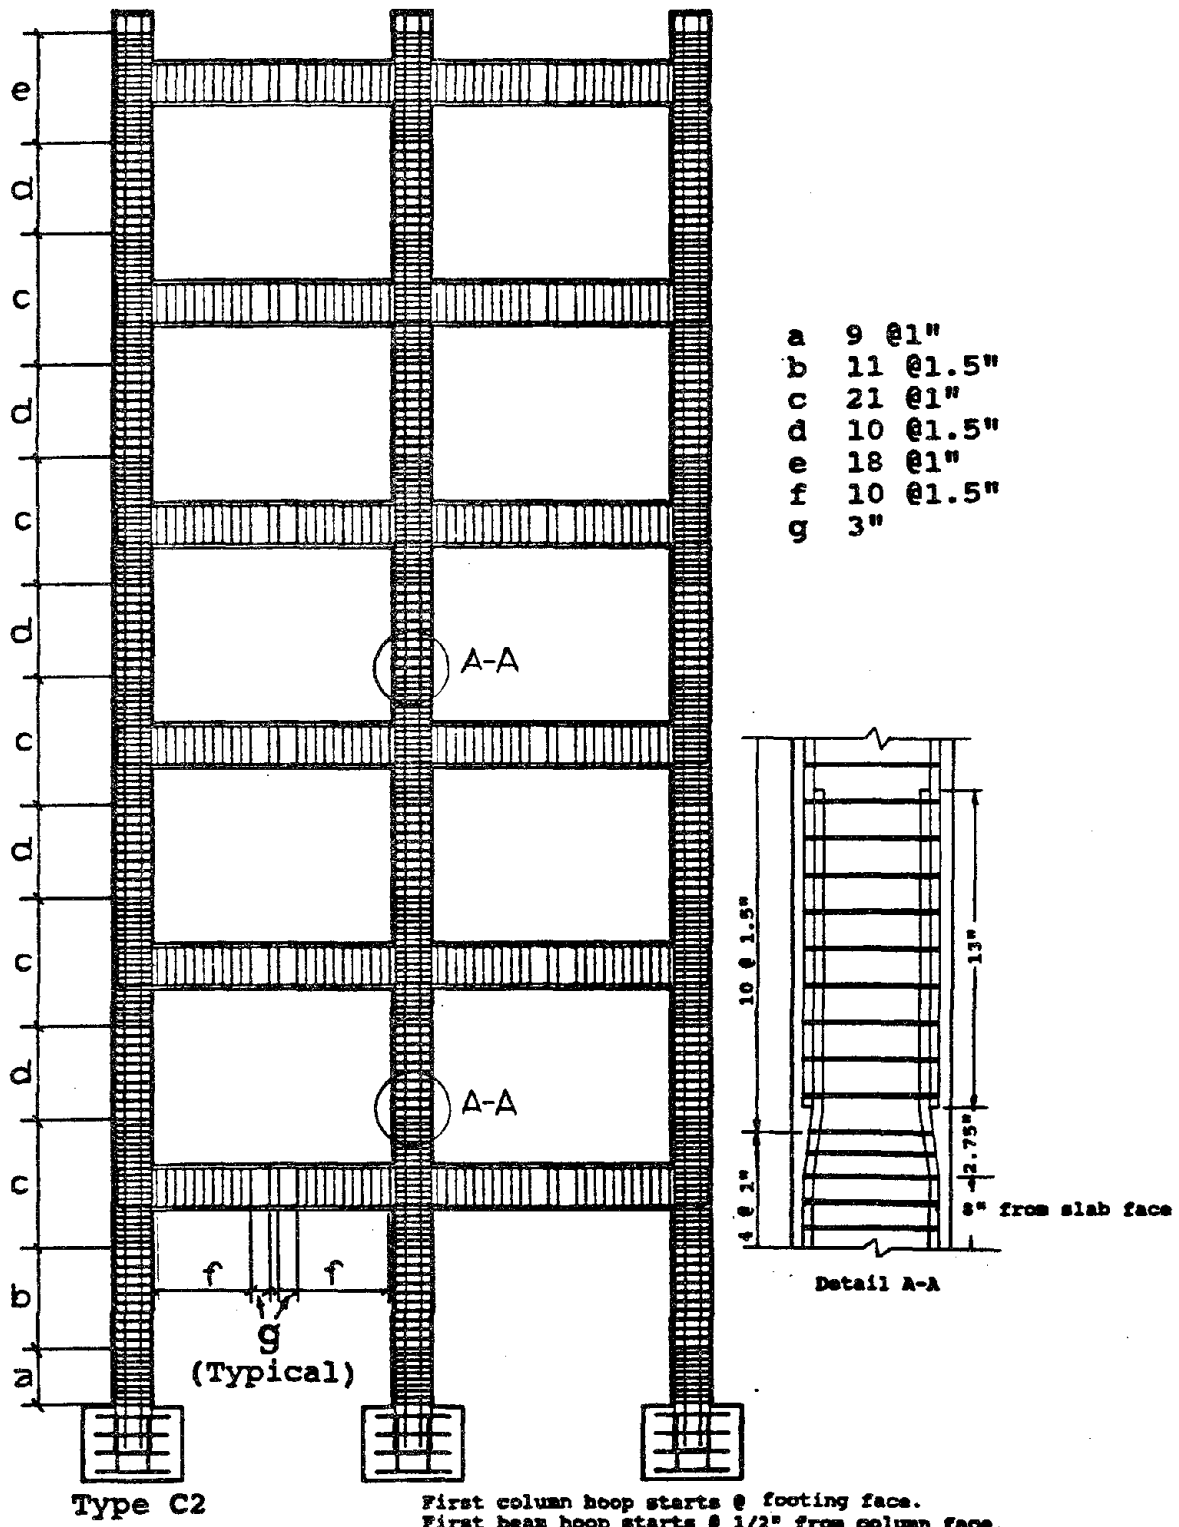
(b) Transverse Reinforcement (Short Direction).
